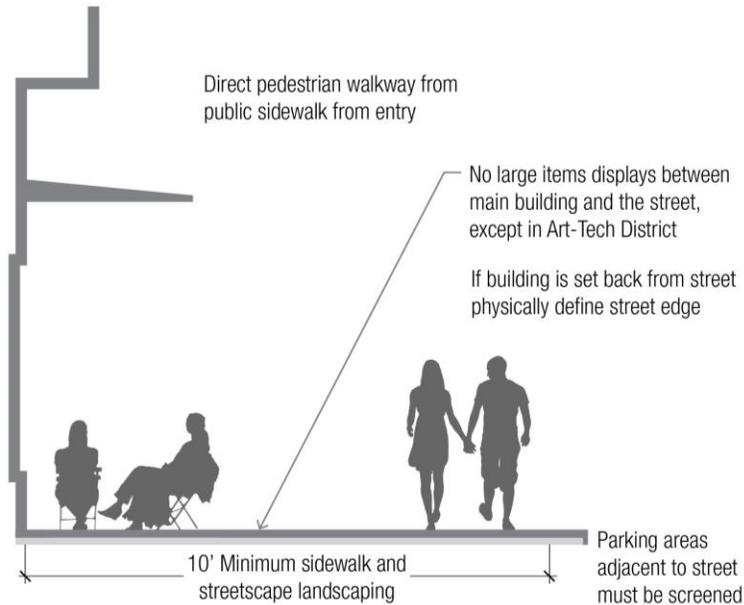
E.1: Requirements for development adjacent to Type C streets (this diagram is for illustrative purposes only. See section 18.120.220.E for stated requirements).
